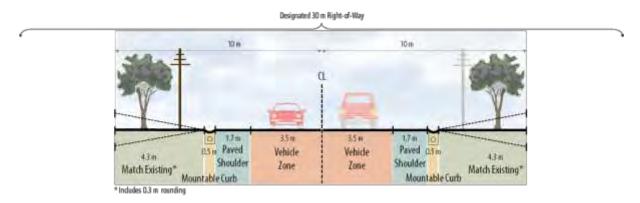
11.4 m Platform Semi-Rural Cross-Section for Olde Base Line Road
